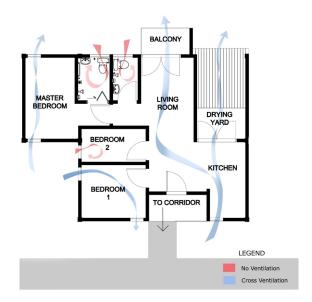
Natural Ventilation for the Proposed Floor Layout
